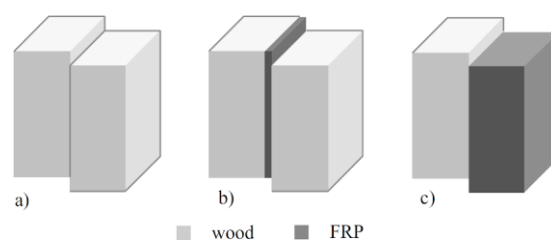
Block-shear specimens: a) conventional timber-timber specimen; b) modified timber-FRP specimen for thin reinforcements; c) modified timber-FRP specimen for thick reinforcements (Lopez-Anido et al. 2005).
